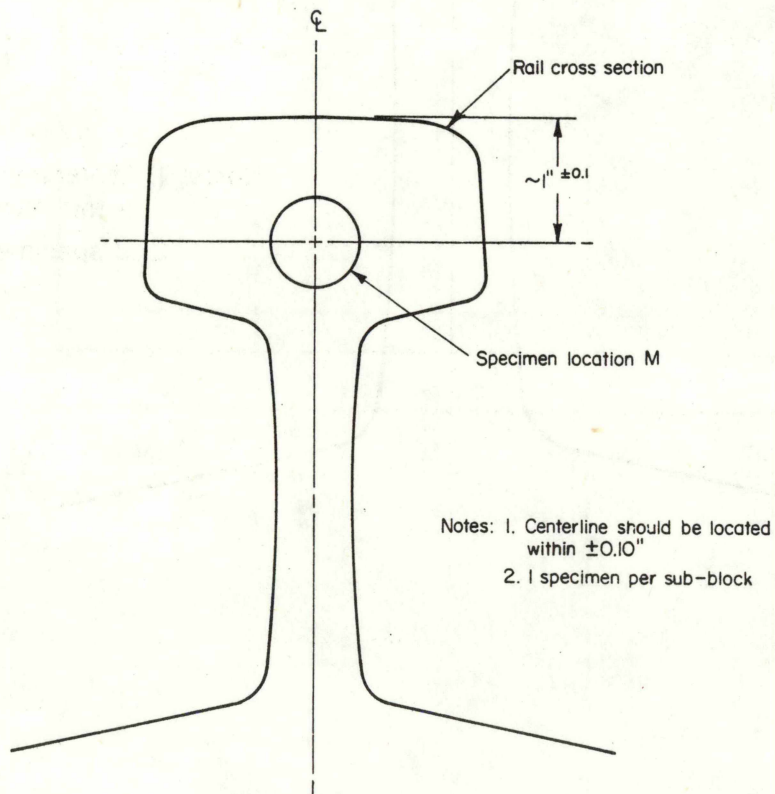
CENTER-HEAD SPECIMEN LOCATION
